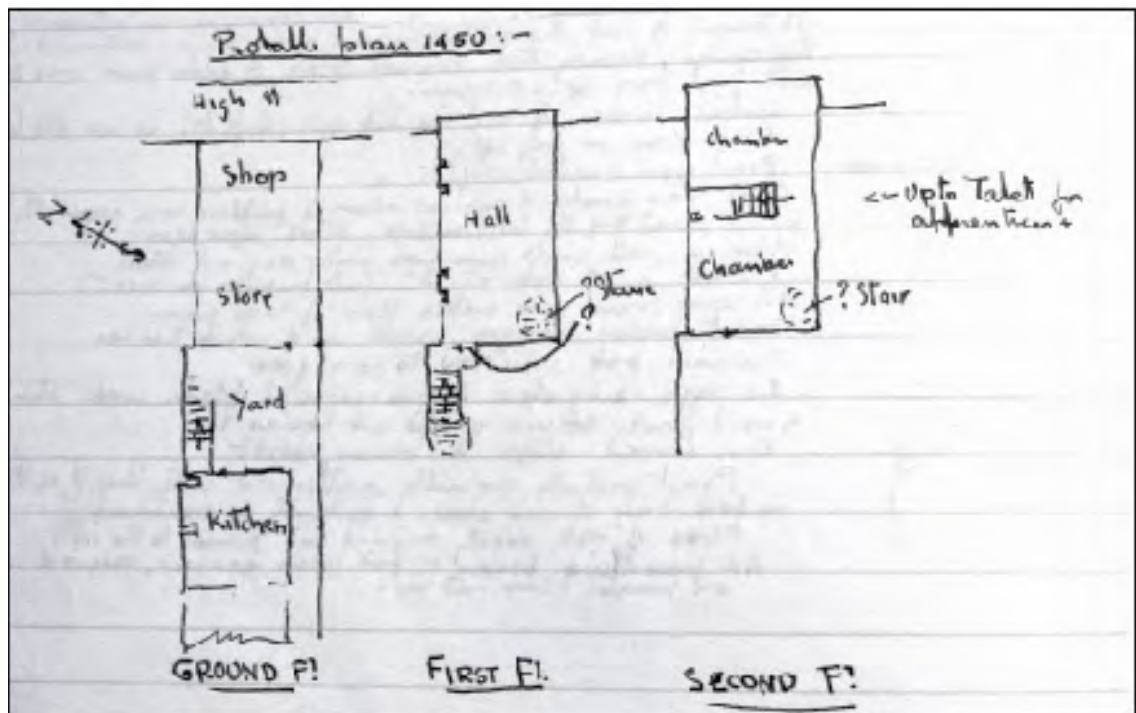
Sketch plan by Bruce Oliver, 1947: Conjectural reconstruction of the plans of ground, first and second floors around 1450.
